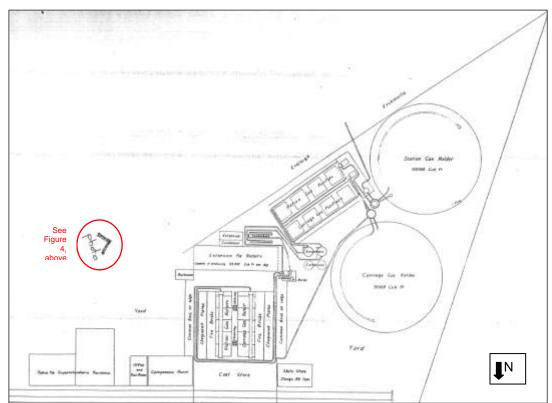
The Gas Works Eveleigh General Arrangement, plan c.1917. This plan names each section of the structures on the site. It dates from the same period as the photo on the previous page at Figure 4.
